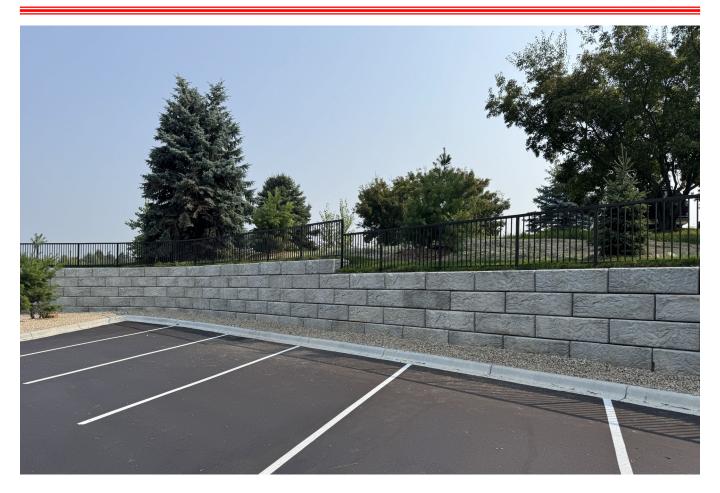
& 4: Reinforced Soil Wall Supporting Residential Infrastructure
